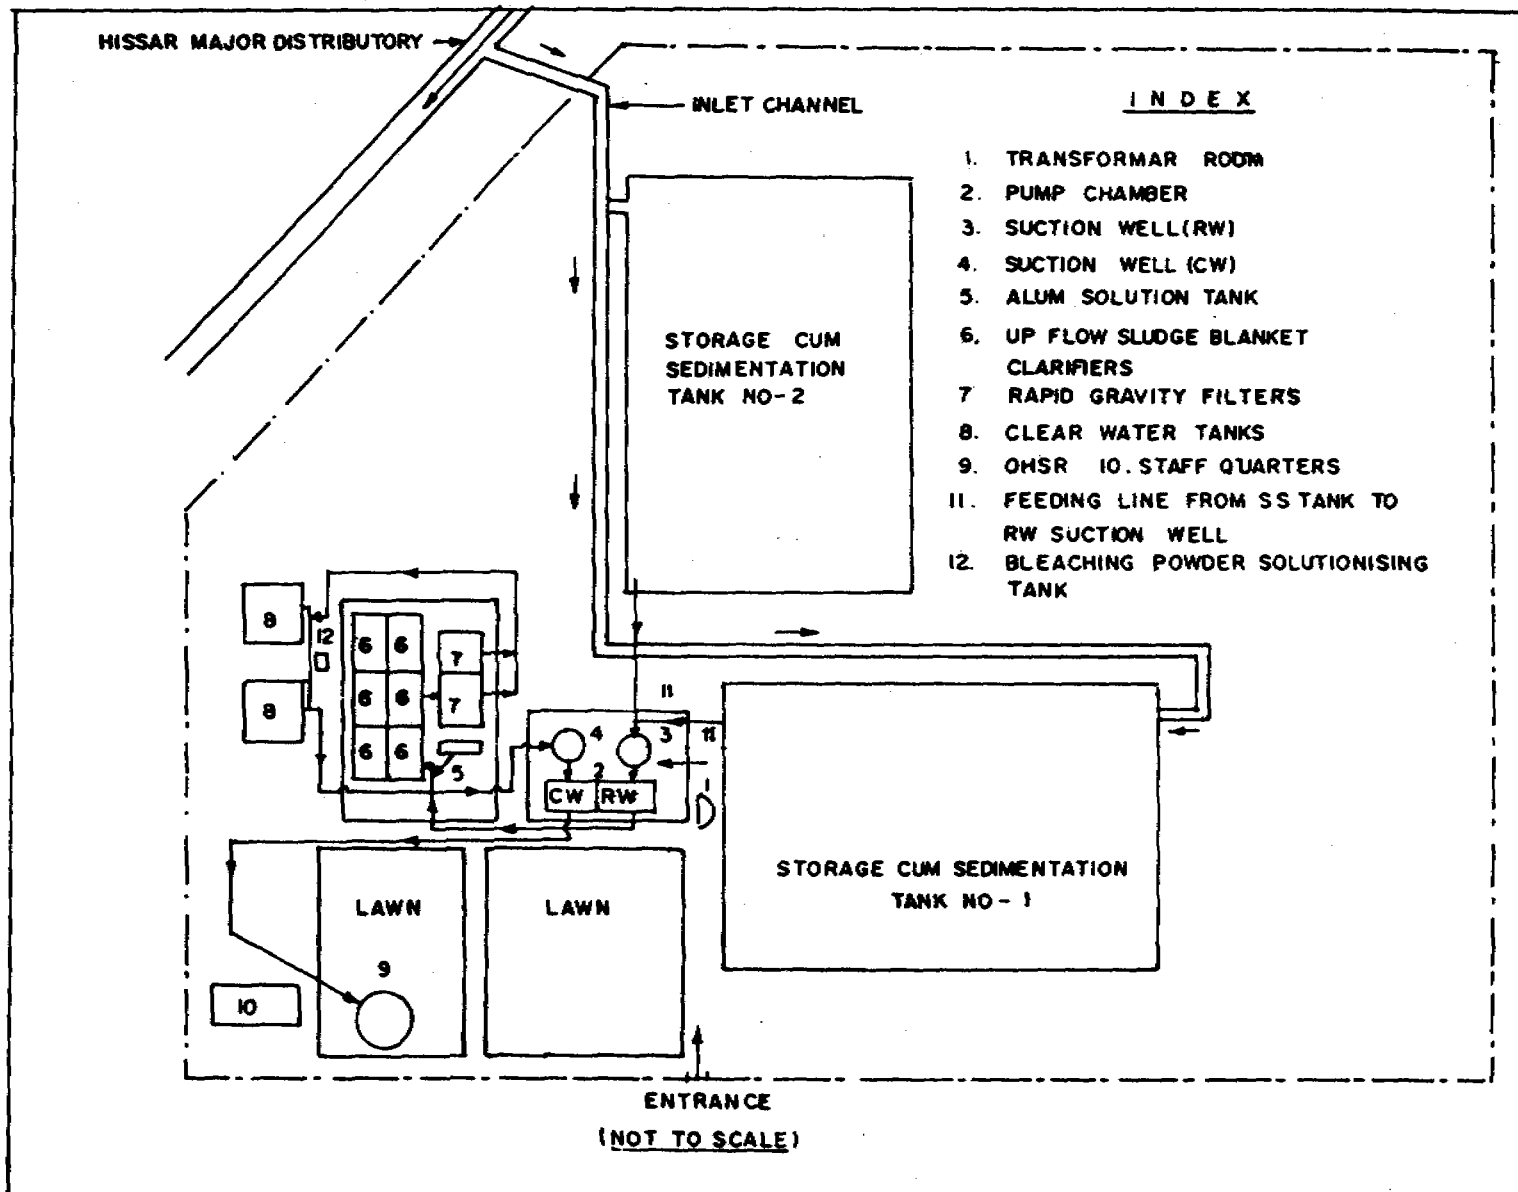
LAYOUT PLAN OF MAIN WATER WORKS - HISSAR
